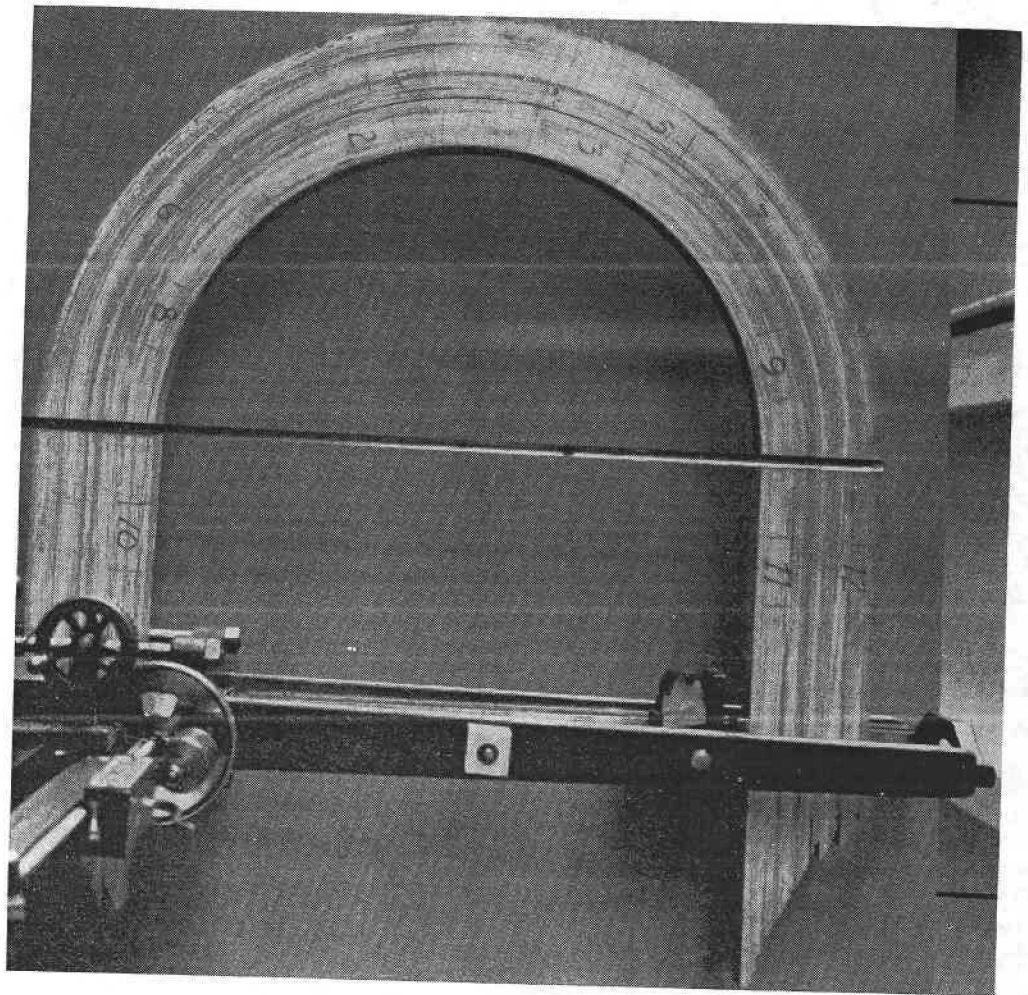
Radial tension specimen in position, in machine after test. Test is made by pulling ends of specimen apart. Note circumferential cracks where tension failure has occurred.
